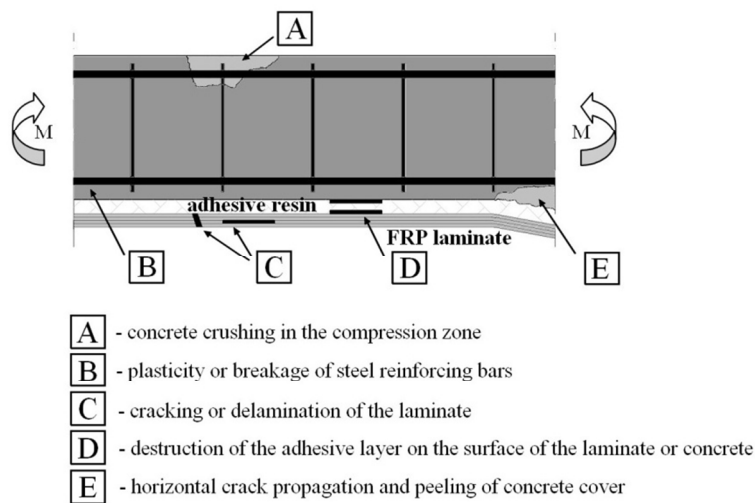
Failure modes of a reinforced concrete beam strengthened with a composite laminate
